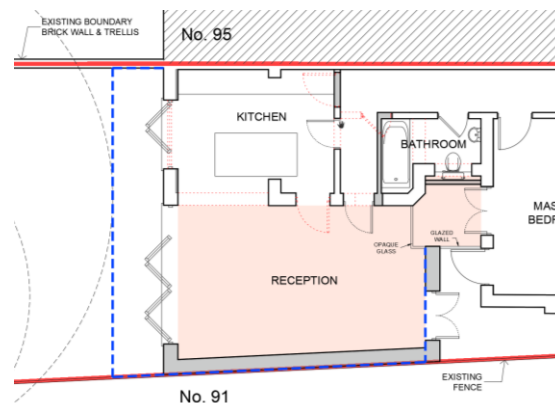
Comparative floor layout extract, blue line shows outline of the initial proposal.
